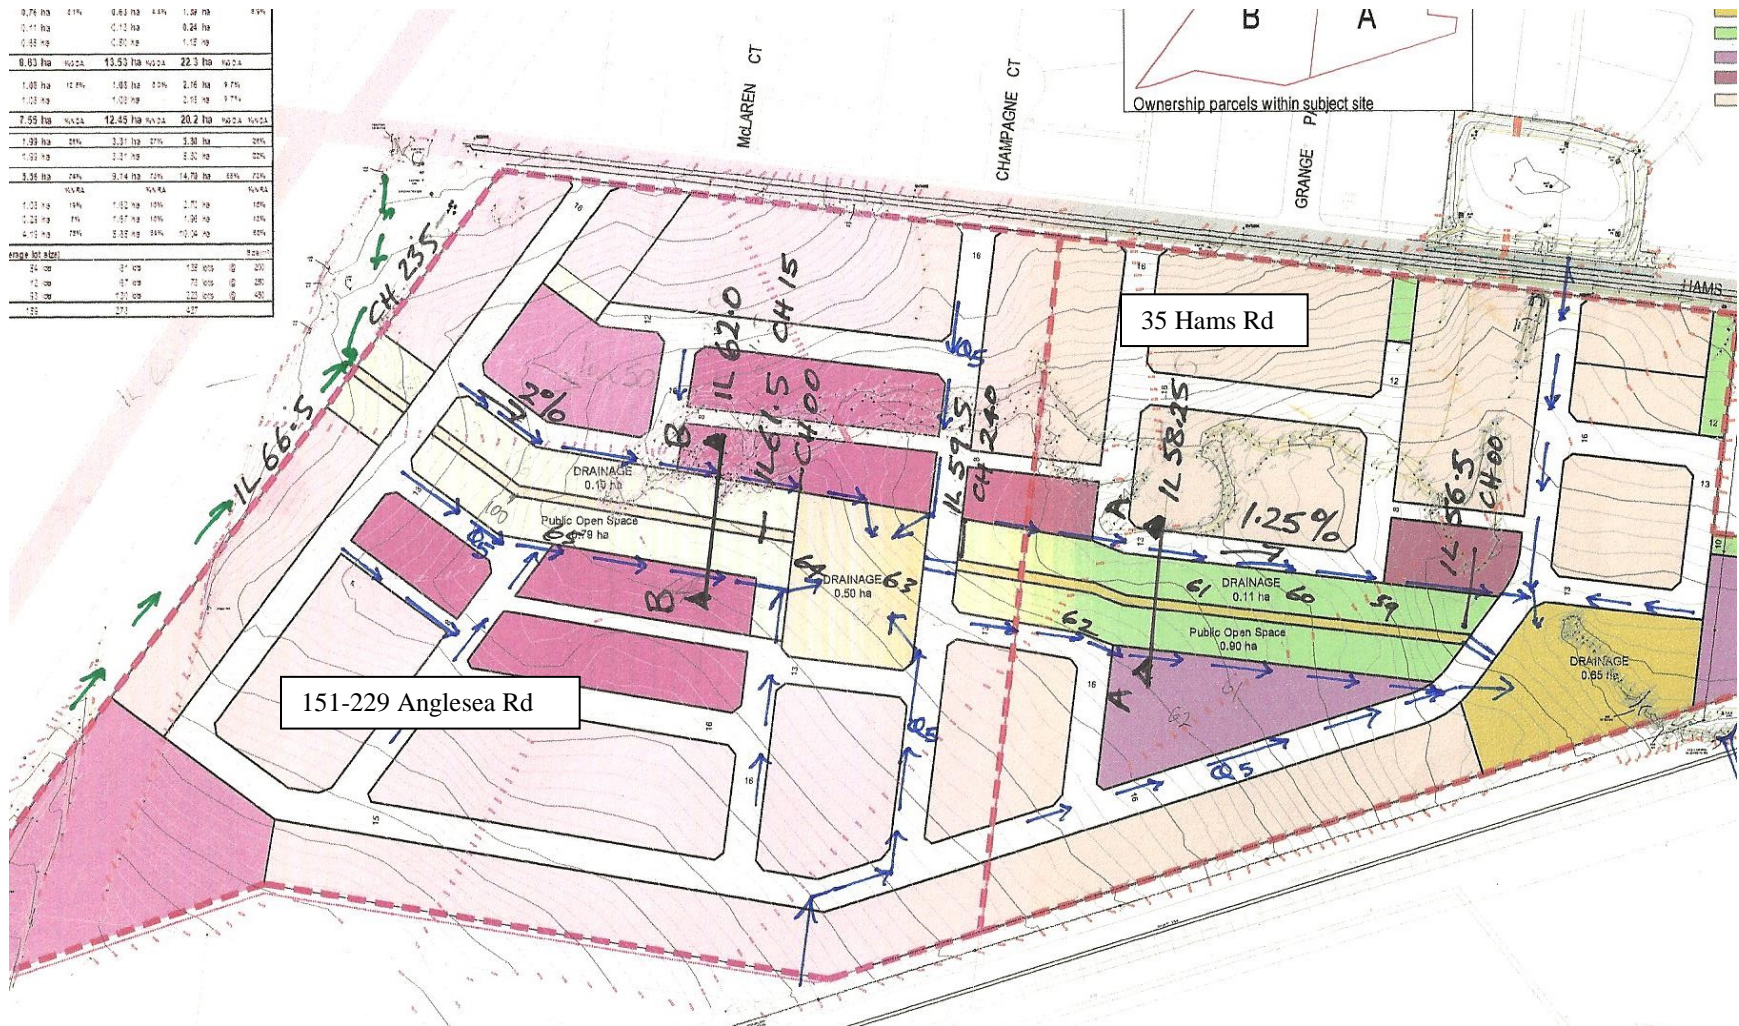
Proposed Open Waterway Grades and Levels and main pipes. Refer to Figure 4 for typical cross-sections A-A, B-B
